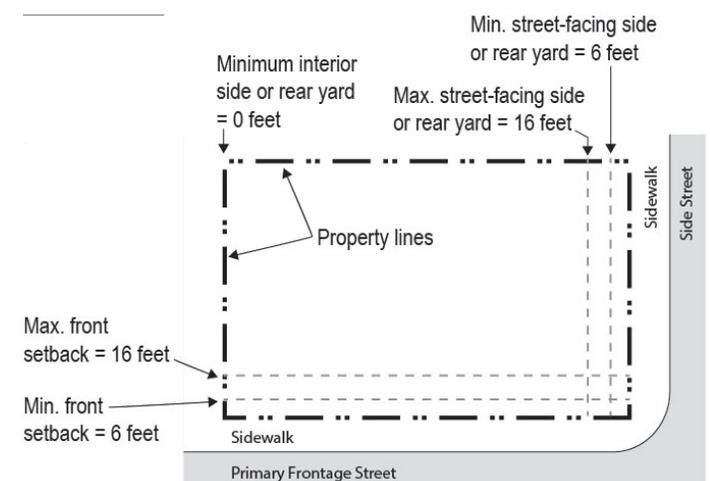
RC-MU Setbacks - with ground-floor residential
